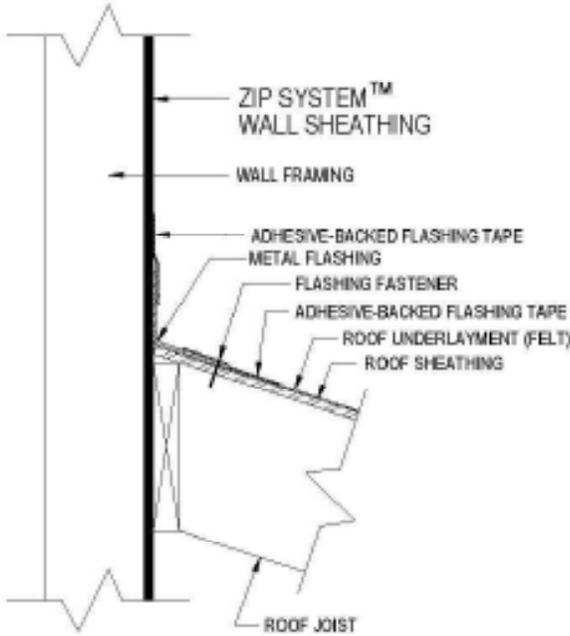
ROOF-WALL INTERSECTION (OPTION 1)
